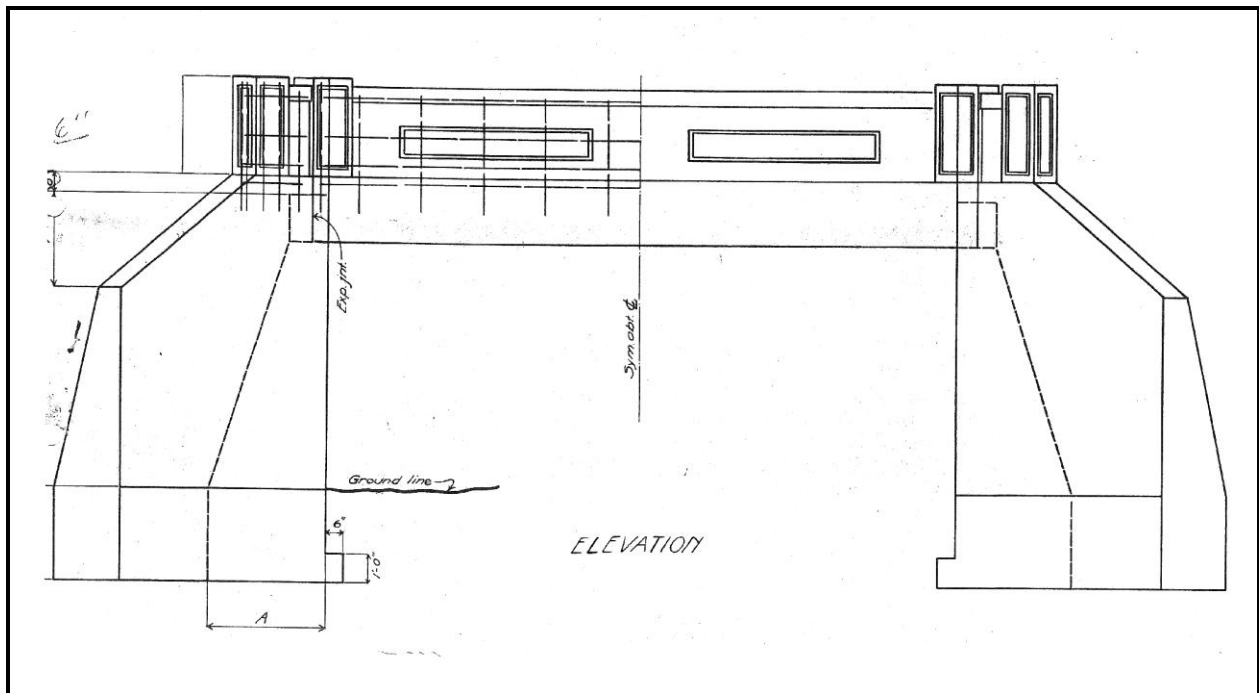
Elevation of 1916 Concrete Slab Bridge Designed by West Virginia Division of Highways
